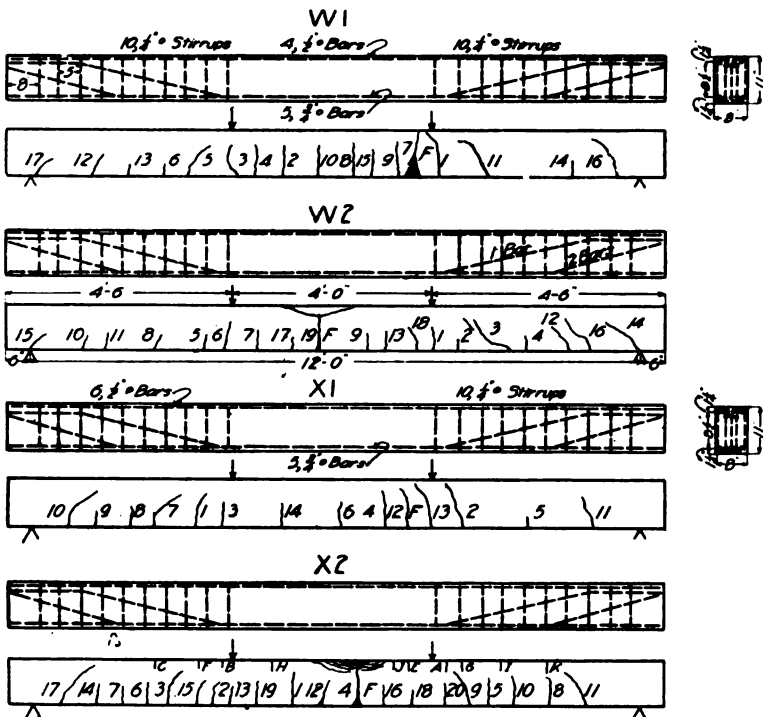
BEAMS OF SERIES E—REINFORCEMENT AND CRACKS.
